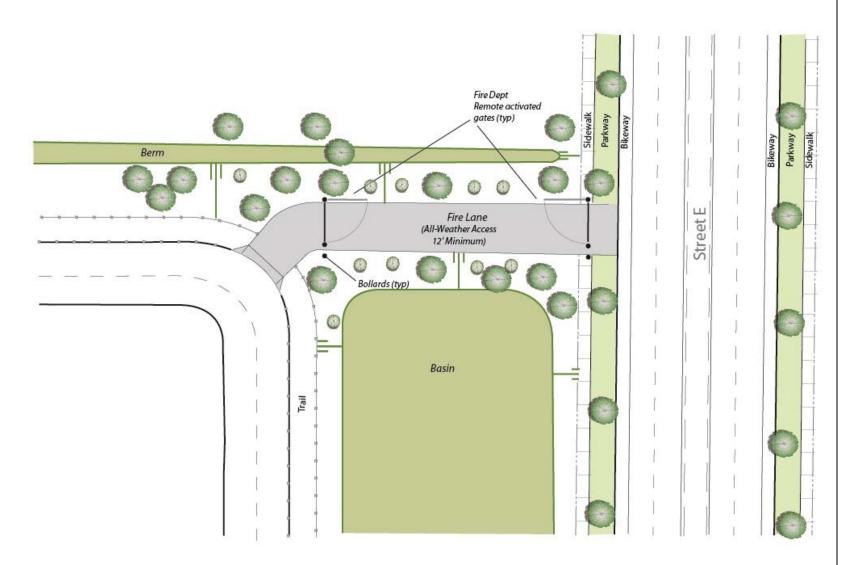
Multi-Use Trail Plan (pg.3-13)
